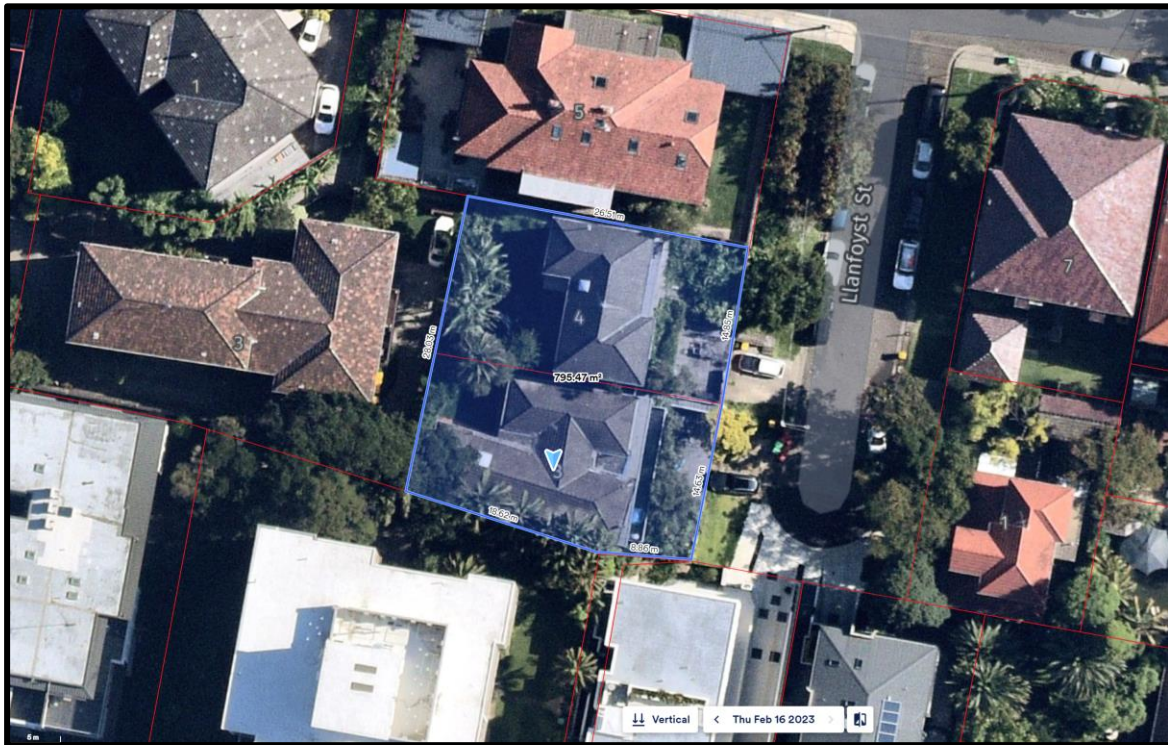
Location Plan Demonstrating the Site Area Hatched in Blue (Source: Nearmap).
